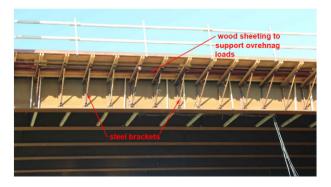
Overhang deck formed by wood sheathing supported with cantilever steel brackets.
